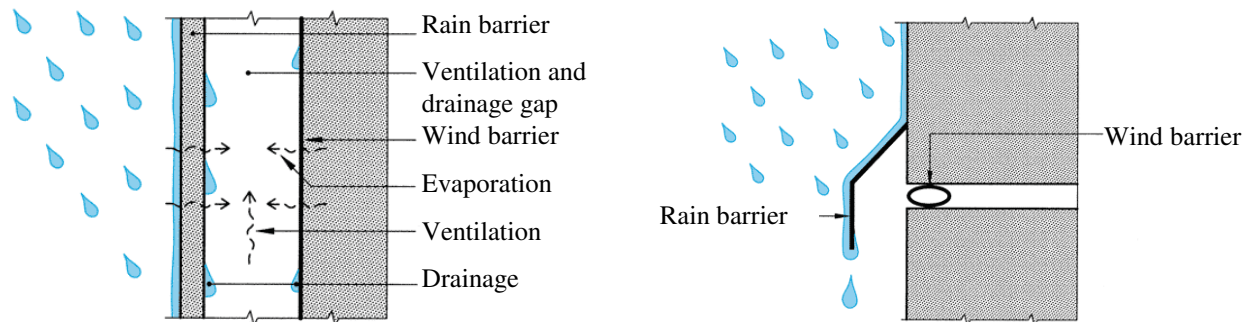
Detailed explanation of two-stage tightening. The left figure shows a ventilated cladding. A typical joint is shown to the right. Vertical cross-sections. (SINTEF Building Research Design Guides 542.003)
